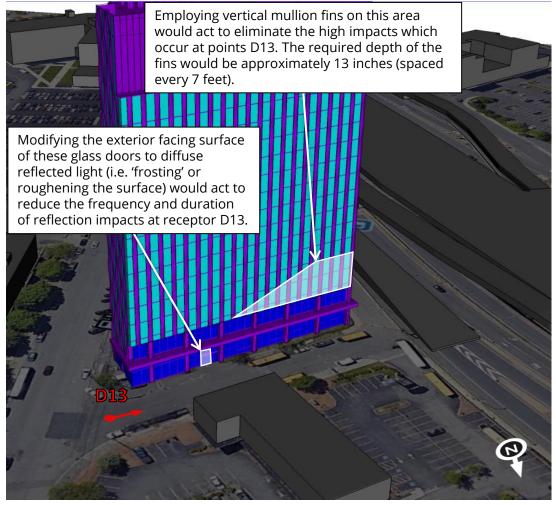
Markup of Facade Locations Where Building-mounted Shading Devices and Surface Modification Would be an Appropriate Approach
